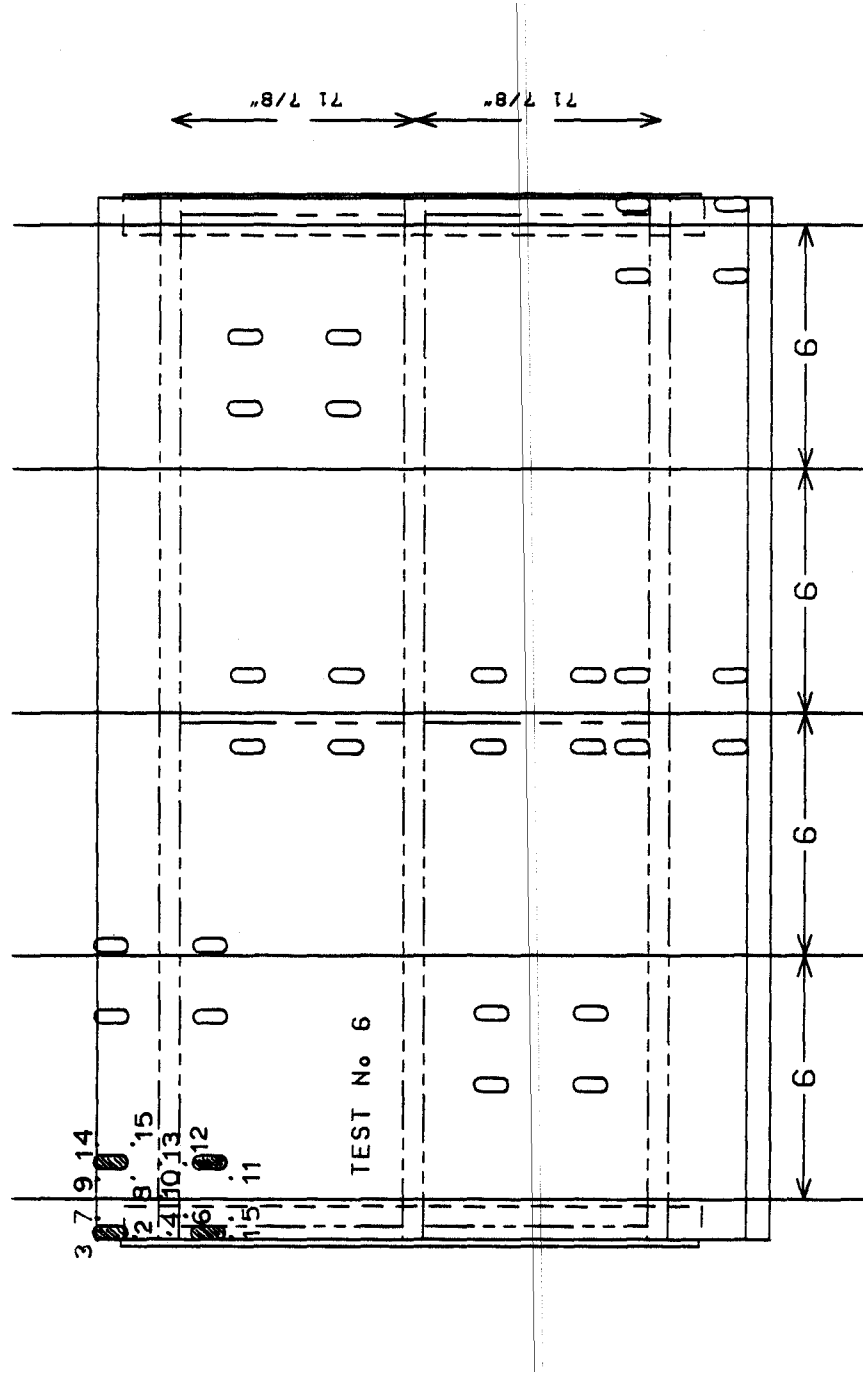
LVDT Locations (Third Bridge - Test No. 6)
